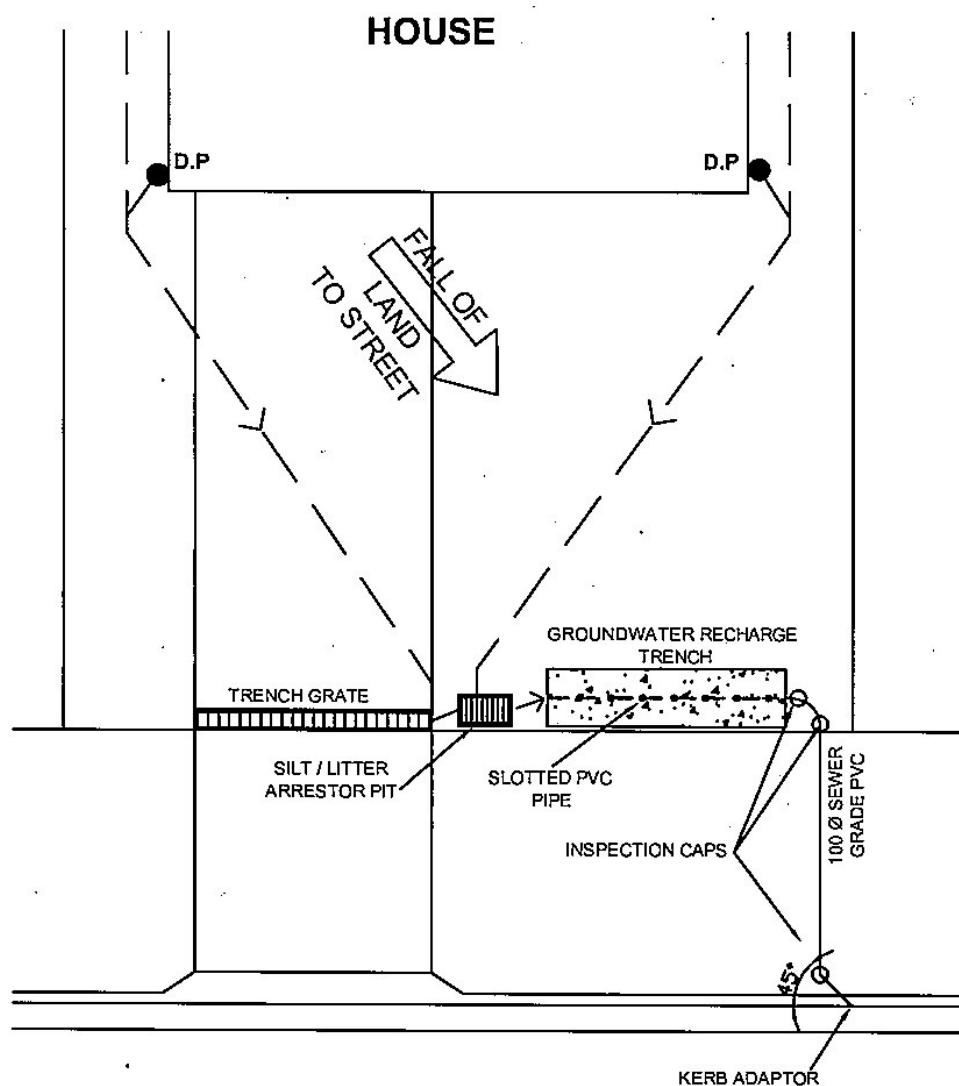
Groundwater Recharge Trench Layout, Fall to Street
